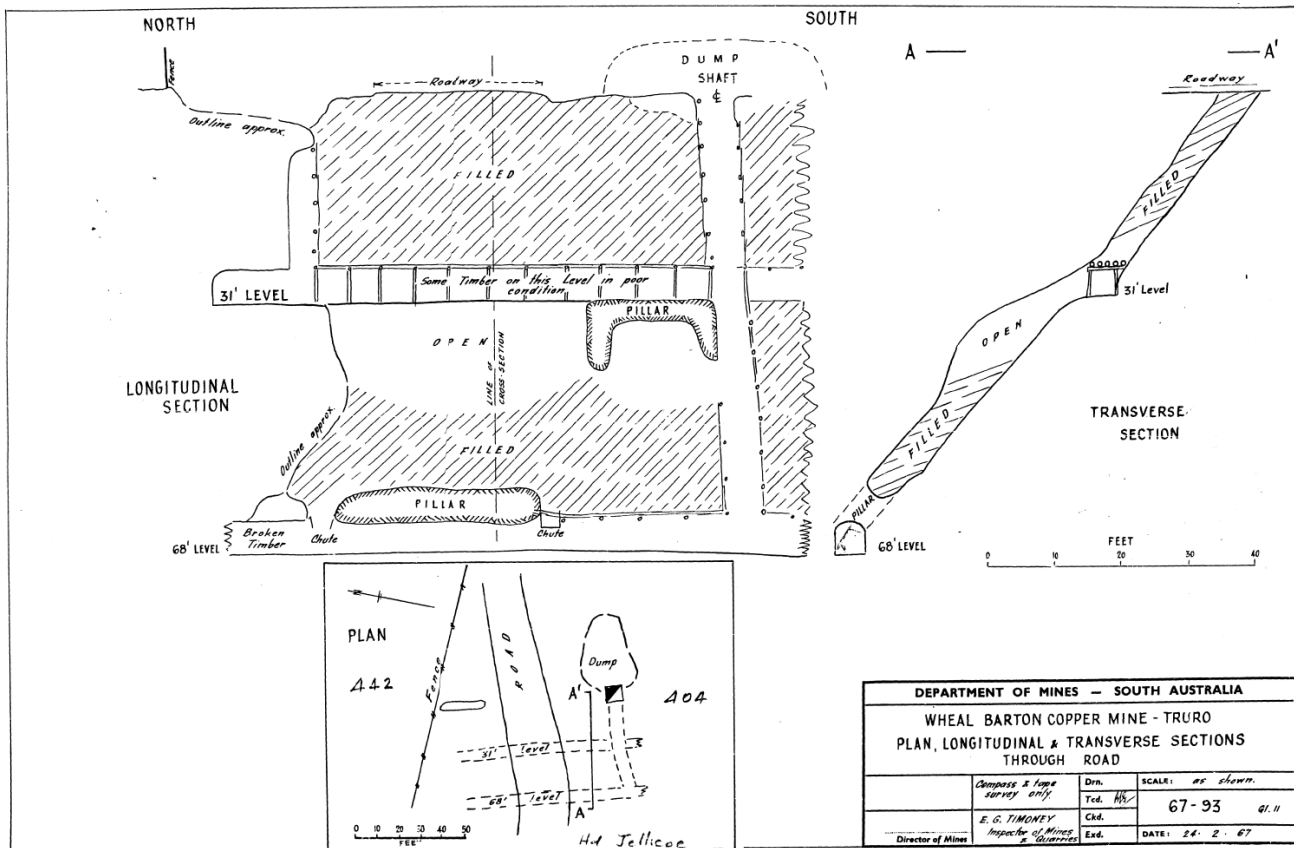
Wheal Barton Copper Mine – Plan, Longitudinal and transverse sections.
